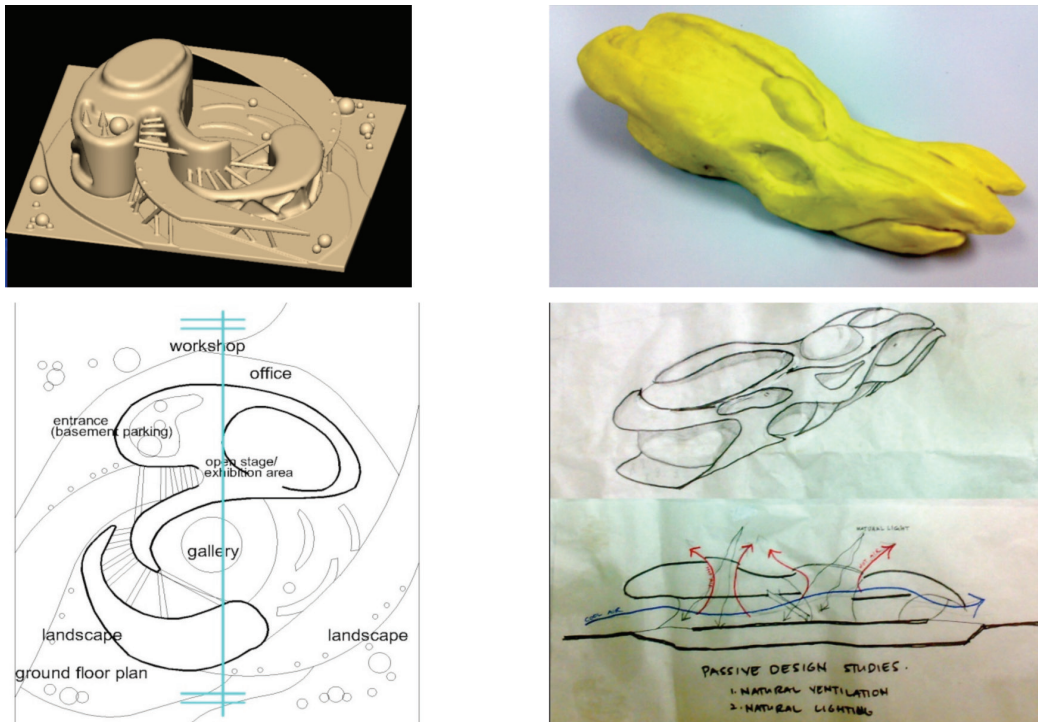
Sample 3D sketching (left) and traditional design (right) outcomes
